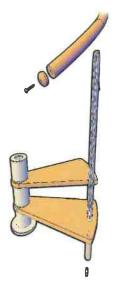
" railing and fastening of posts to steps and to the landing step, fastening of the handrail to columns
